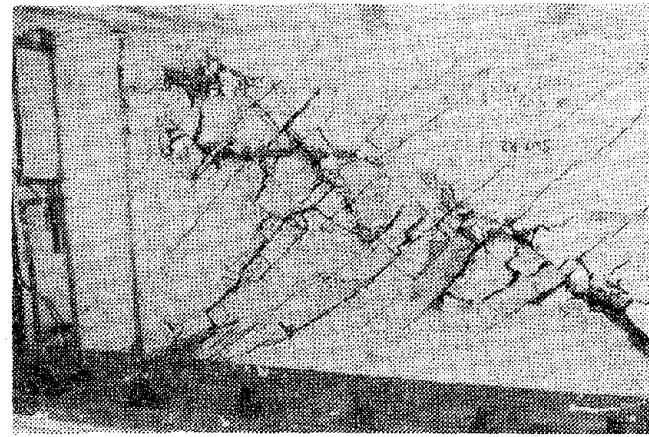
FAILURE ZONE: THIRD-STORY WALL PANEL OF SPECIMEN SW7 R<sub>2</sub>. EXCESSIVE CRUSHING OF CONCRETE AND BUCKLING OF PANEL REINFORCEMENT. LP 547,  $\mu_{\delta} = 3$ .
